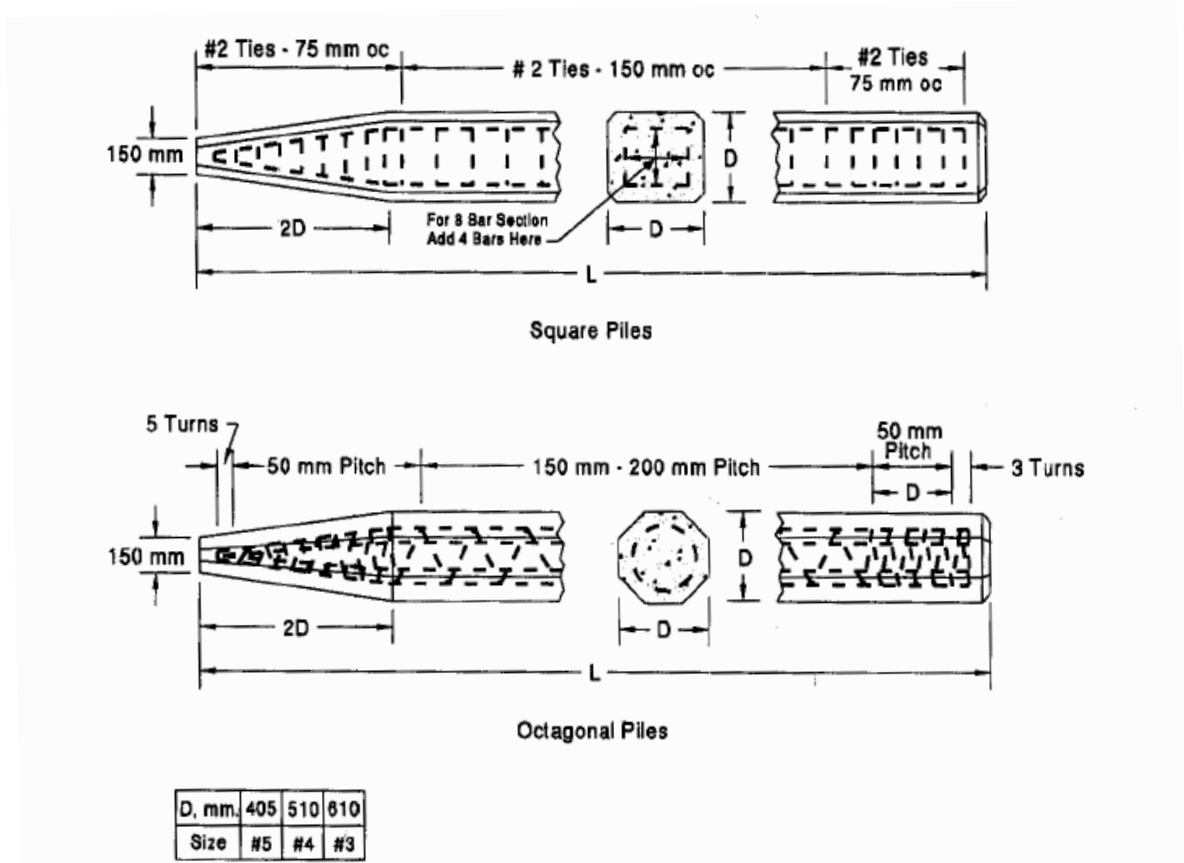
Typical Details of Conventionally Reinforced Concrete Piles (after PCA, 1951)
